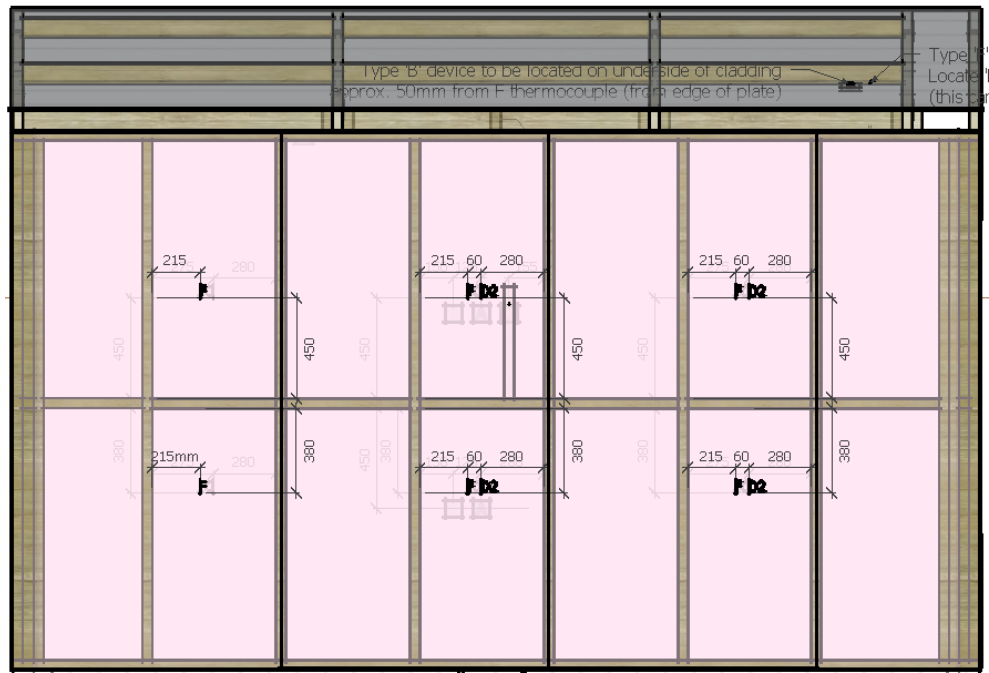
Experiment #2 general layout of thermocouples on fire-rated wall unexposed lining (viewed from outside)
